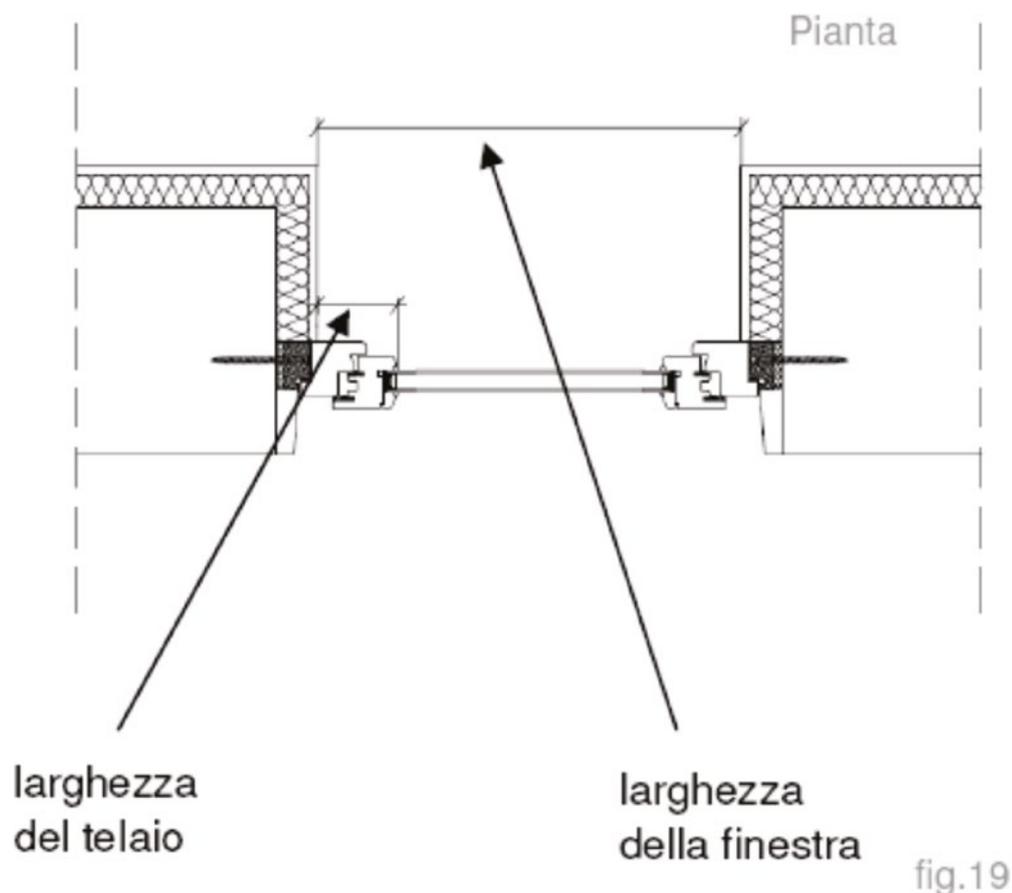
Roof window frame section and insulation panel ($b_f = 89 \text{ mm}$)
